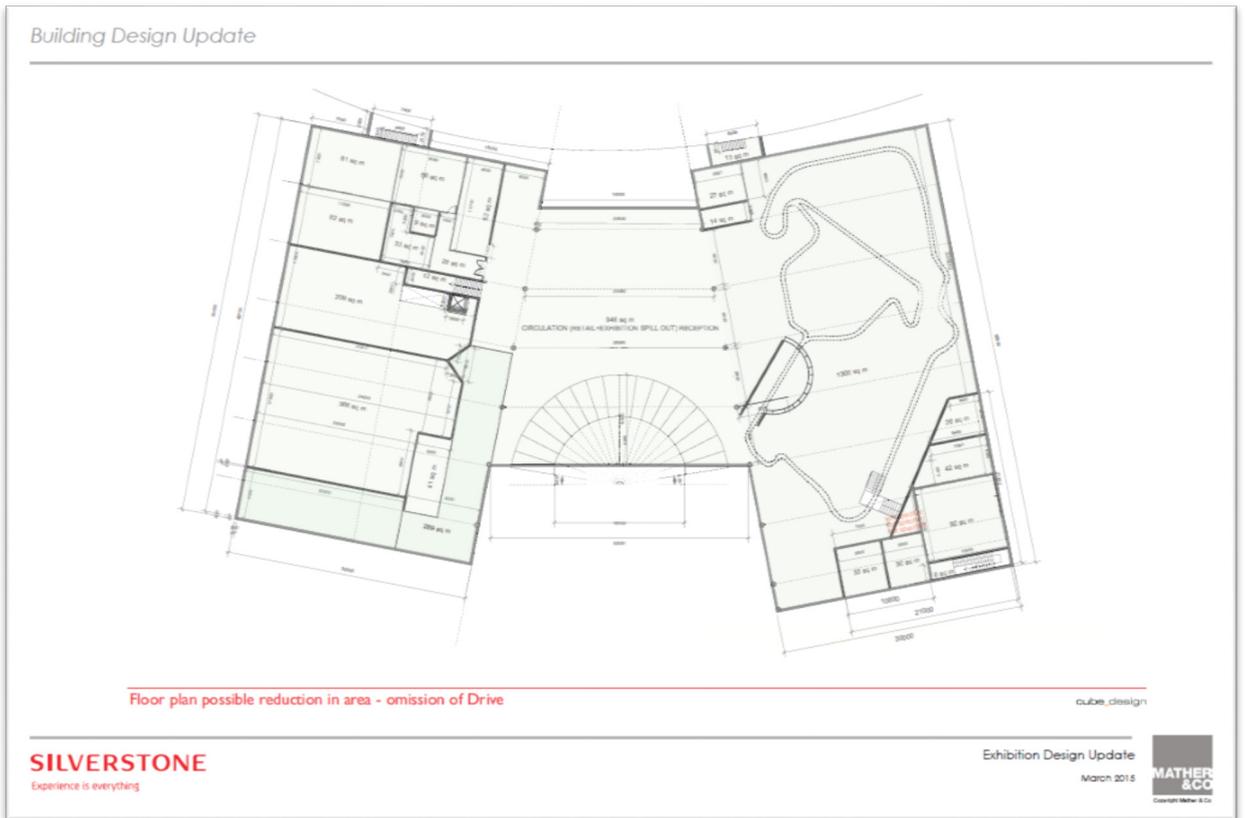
#2 Location, Proposed Floor Plan 3rd March 2015
